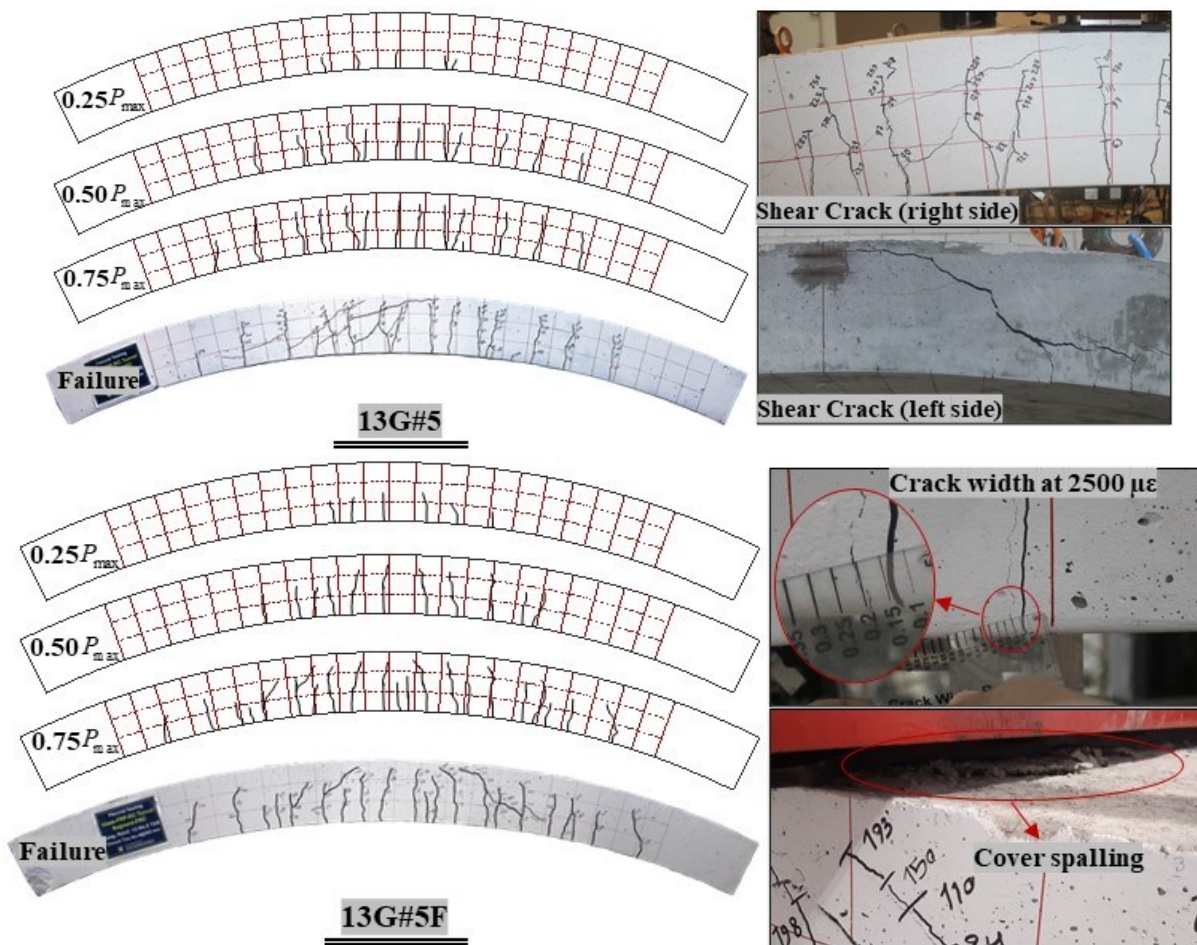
Failure modes and crack patterns of specimens 13G#5 and 13G#5F.
